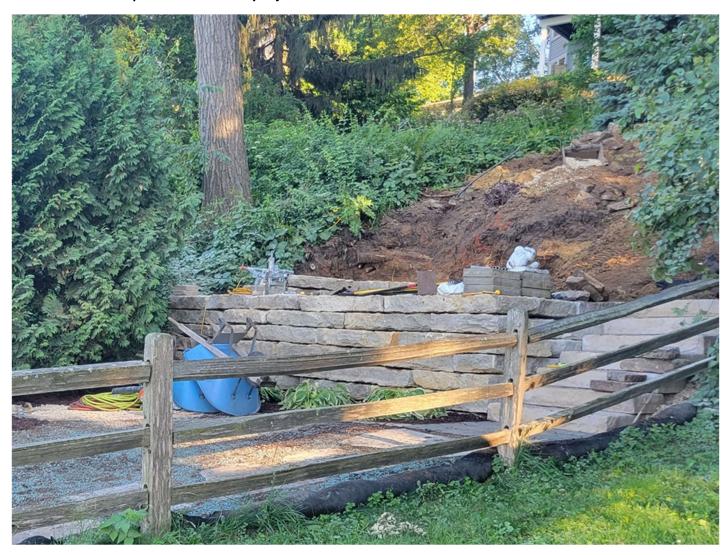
Harrison's tree and foundation auger taken July 1, 20 days before the permit was issued. Note amount of soil removed and heavy equipment on subsoil.
